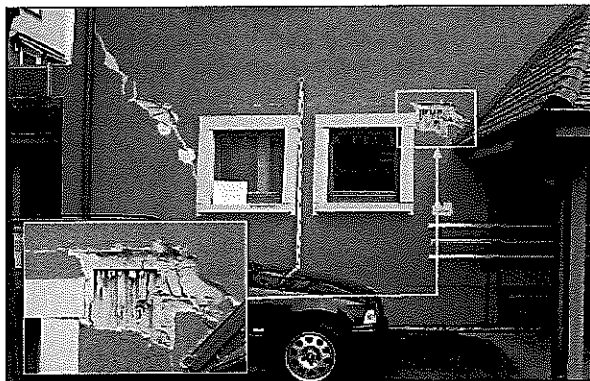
Uplift cracks in building Kirchstraße, inner courtyard, distance to the well field approx. 20 m to the east. Destruction of the supporting masonry, March 2009 (Photo: U. Burbaum).
